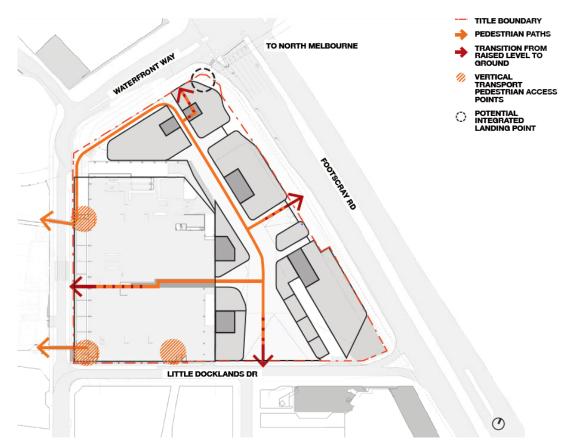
Level 1 pedestrian access from DP Addendum Movement & Parking Plan 4
